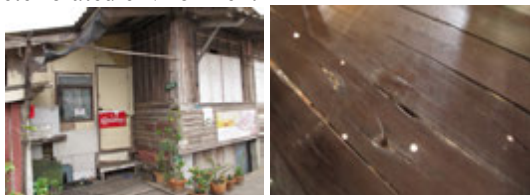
(a) Use of plastic board as a wall (b) Leaking wooden floor
